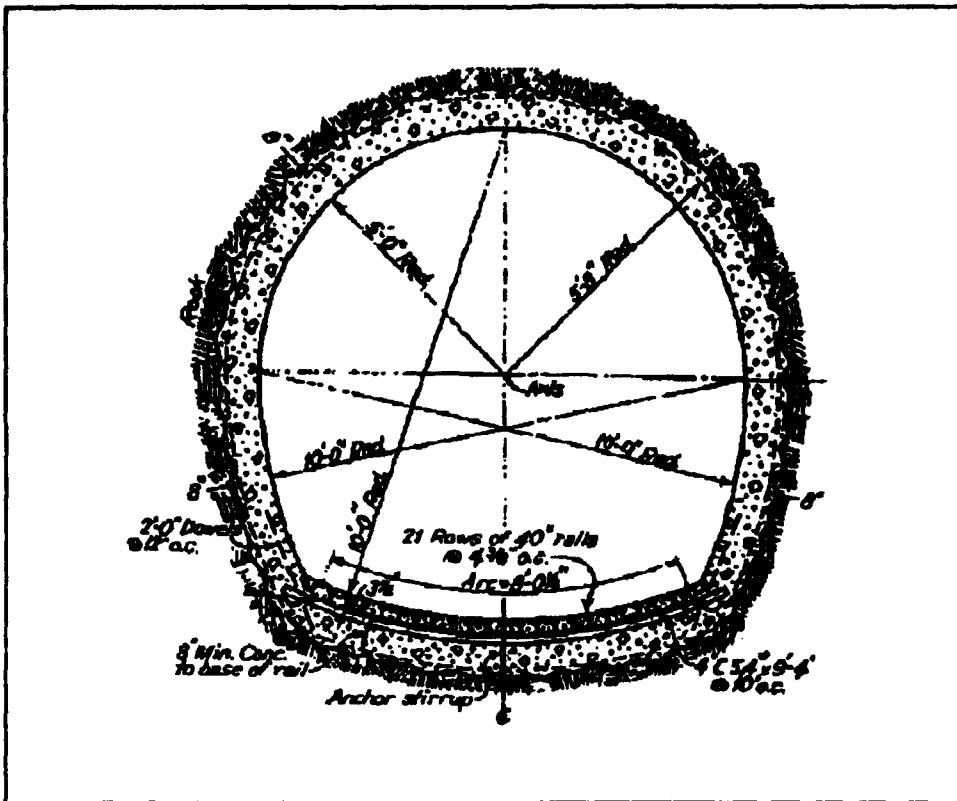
Sketch of tunnel floor overlay, Lowell Creek Dam Diversion Tunnel, 1991
